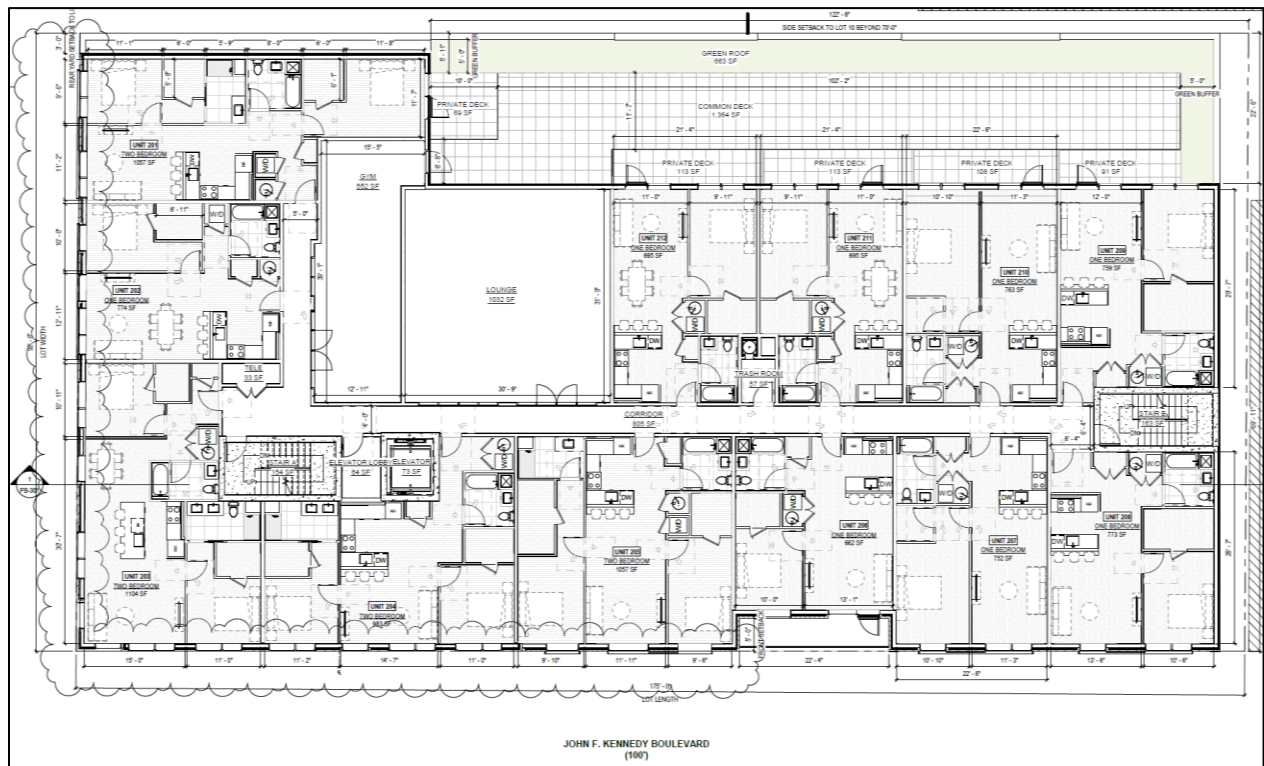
Proposed Upper Level Floor Plan – Living Levels (from plans by GRO Architects 6/17/26)
